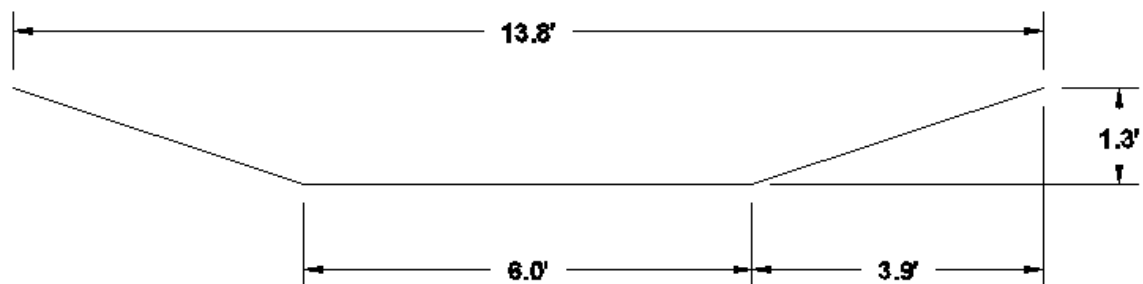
Vegetated Open Channel Design Cross-section (not to scale)
